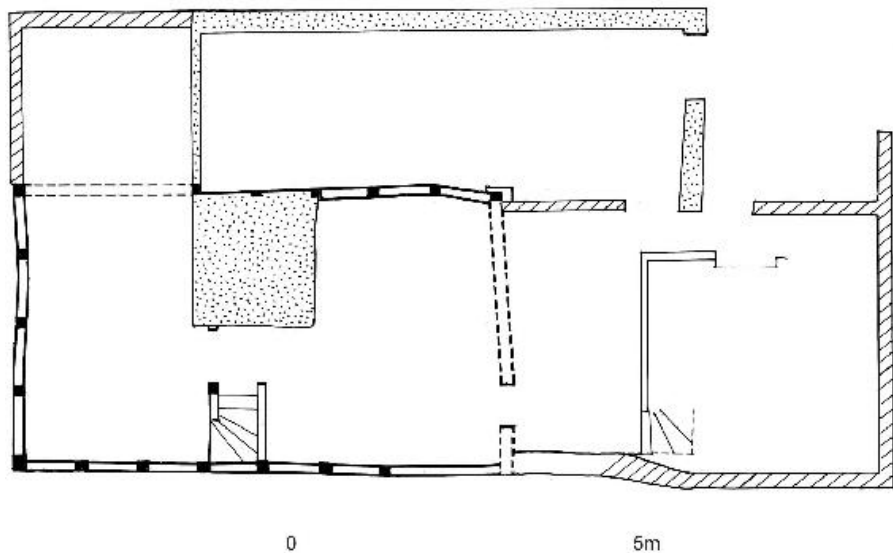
Ground-floor plan of the Essex Arms, Widemarsh Street, with two phases of extension to the south (right) and rear/east (top)
